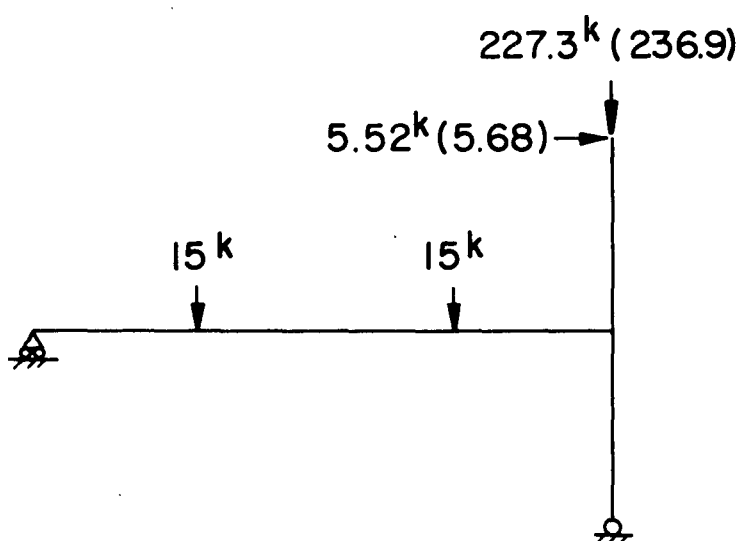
LOADS ON TEST SPECIMEN RC-3
